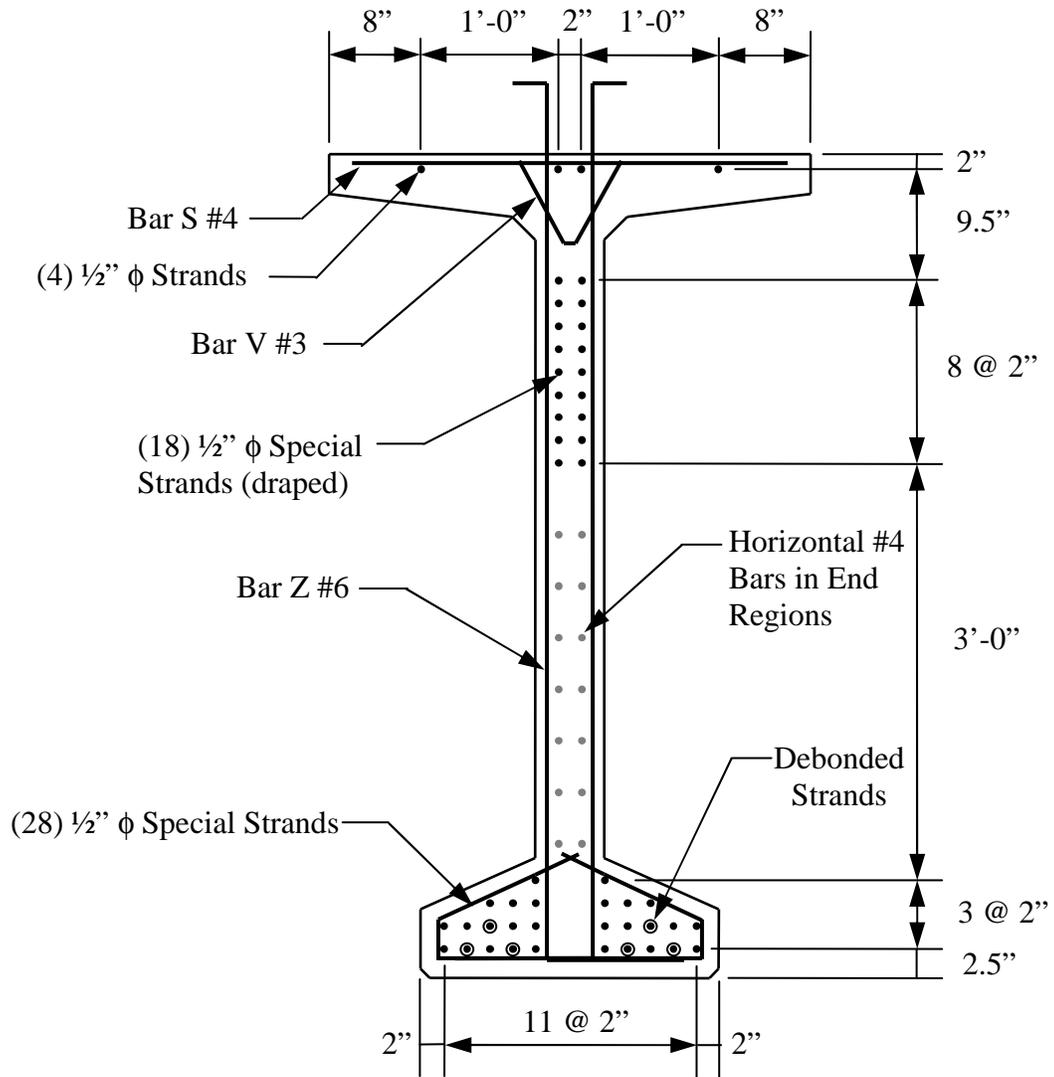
Mild Steel and Strand Arrangement for BT-72 Girder at End of Span
